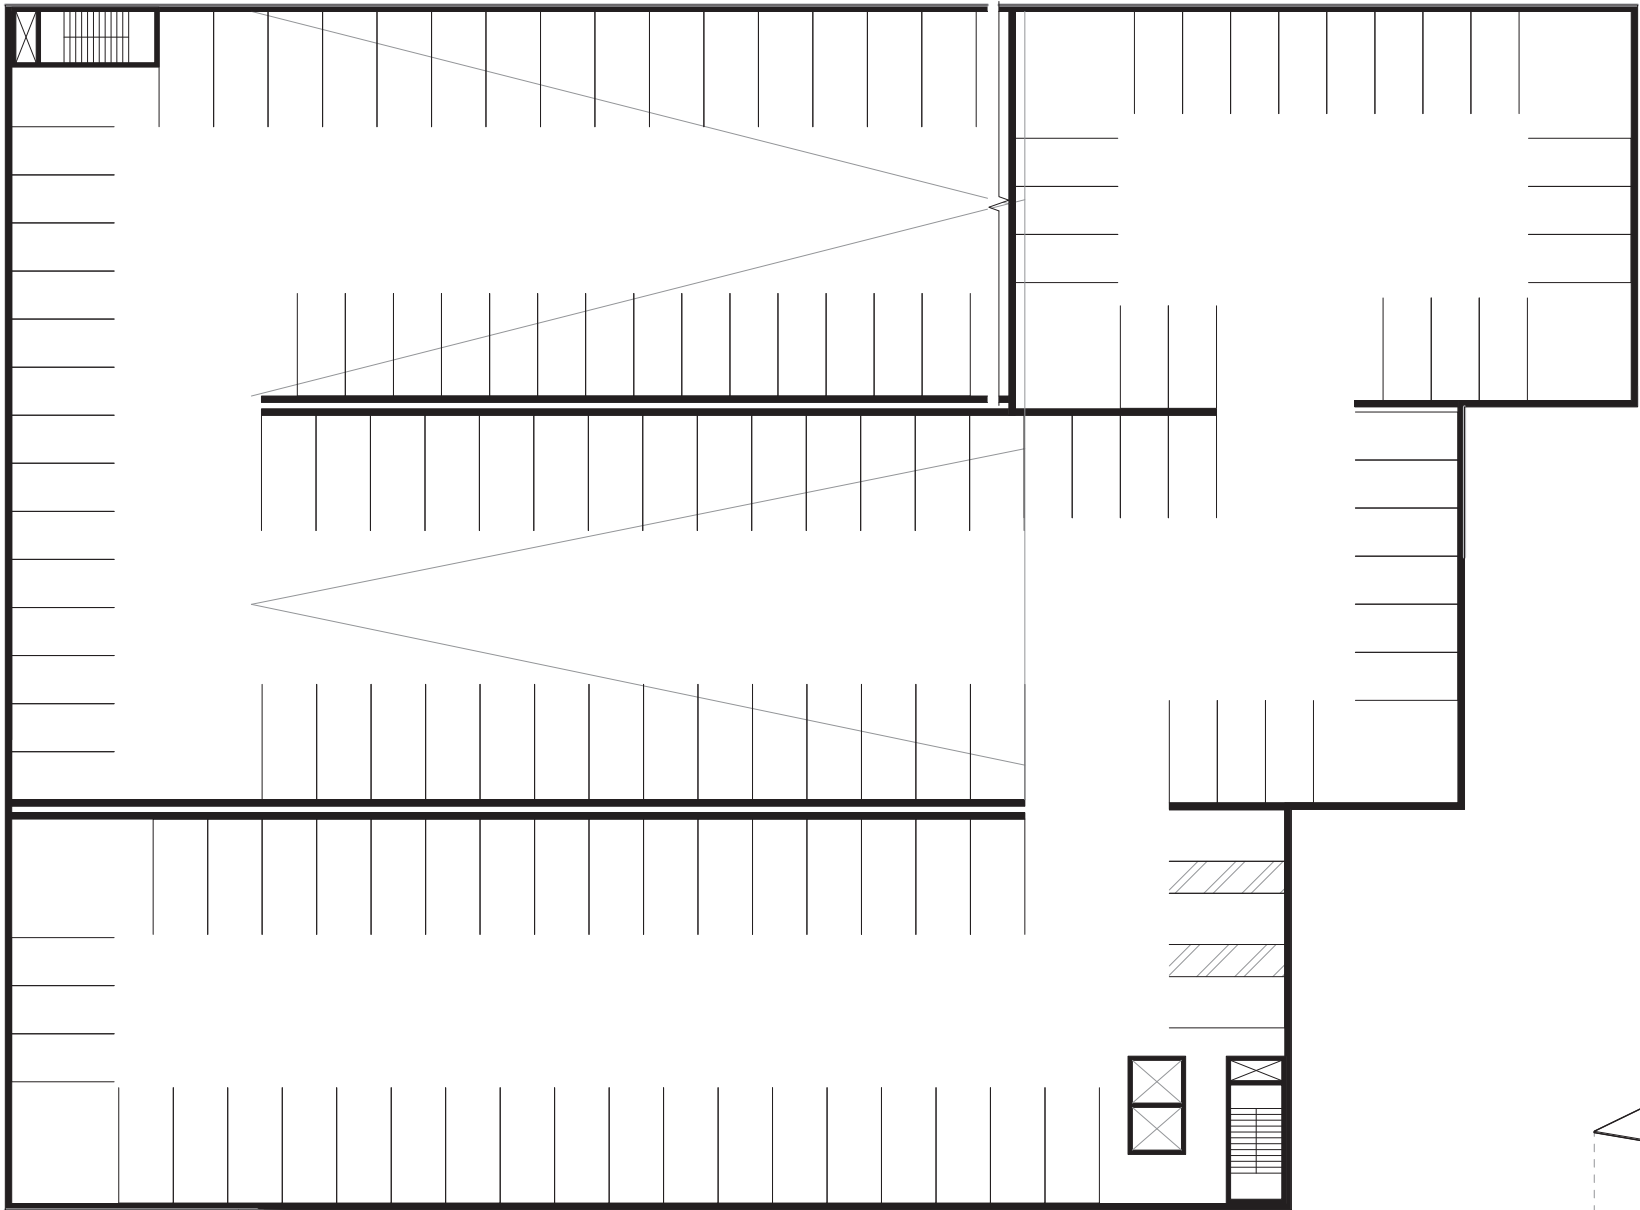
Proposed Vehicle Parking Plans - P1 Level B1
